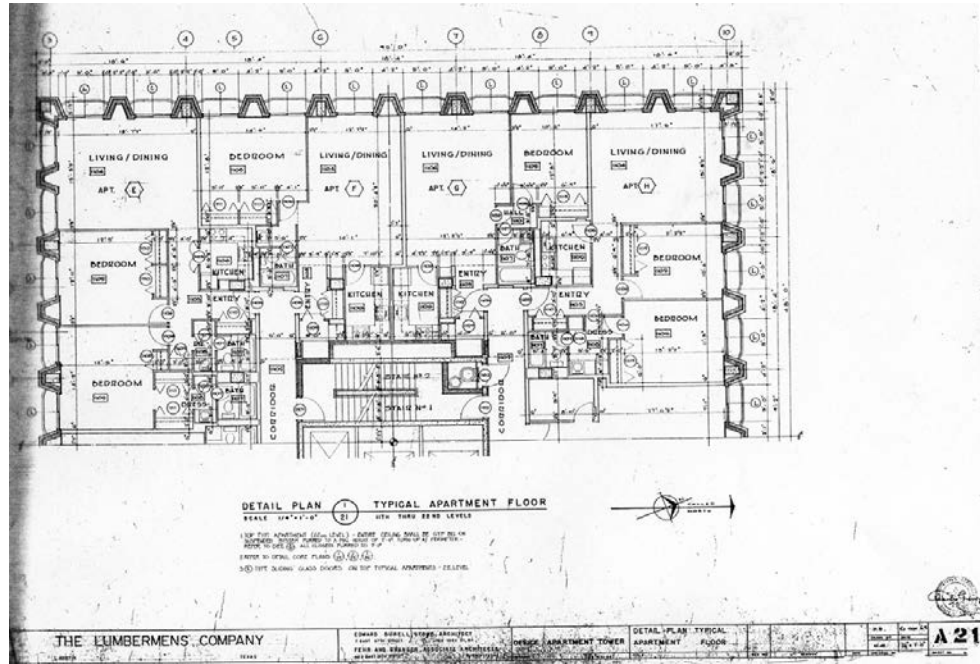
Detail plans for typical apartment floors, levels 11-22.
